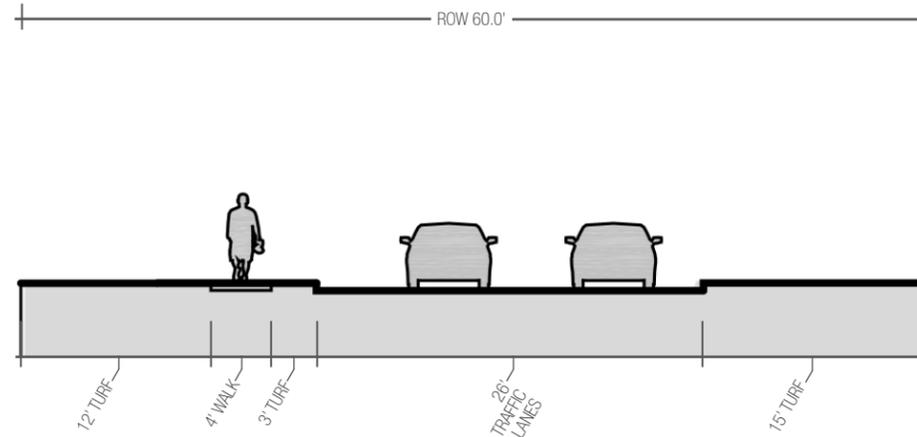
EXISTING SLATER SECTION AND CONDITIONS
